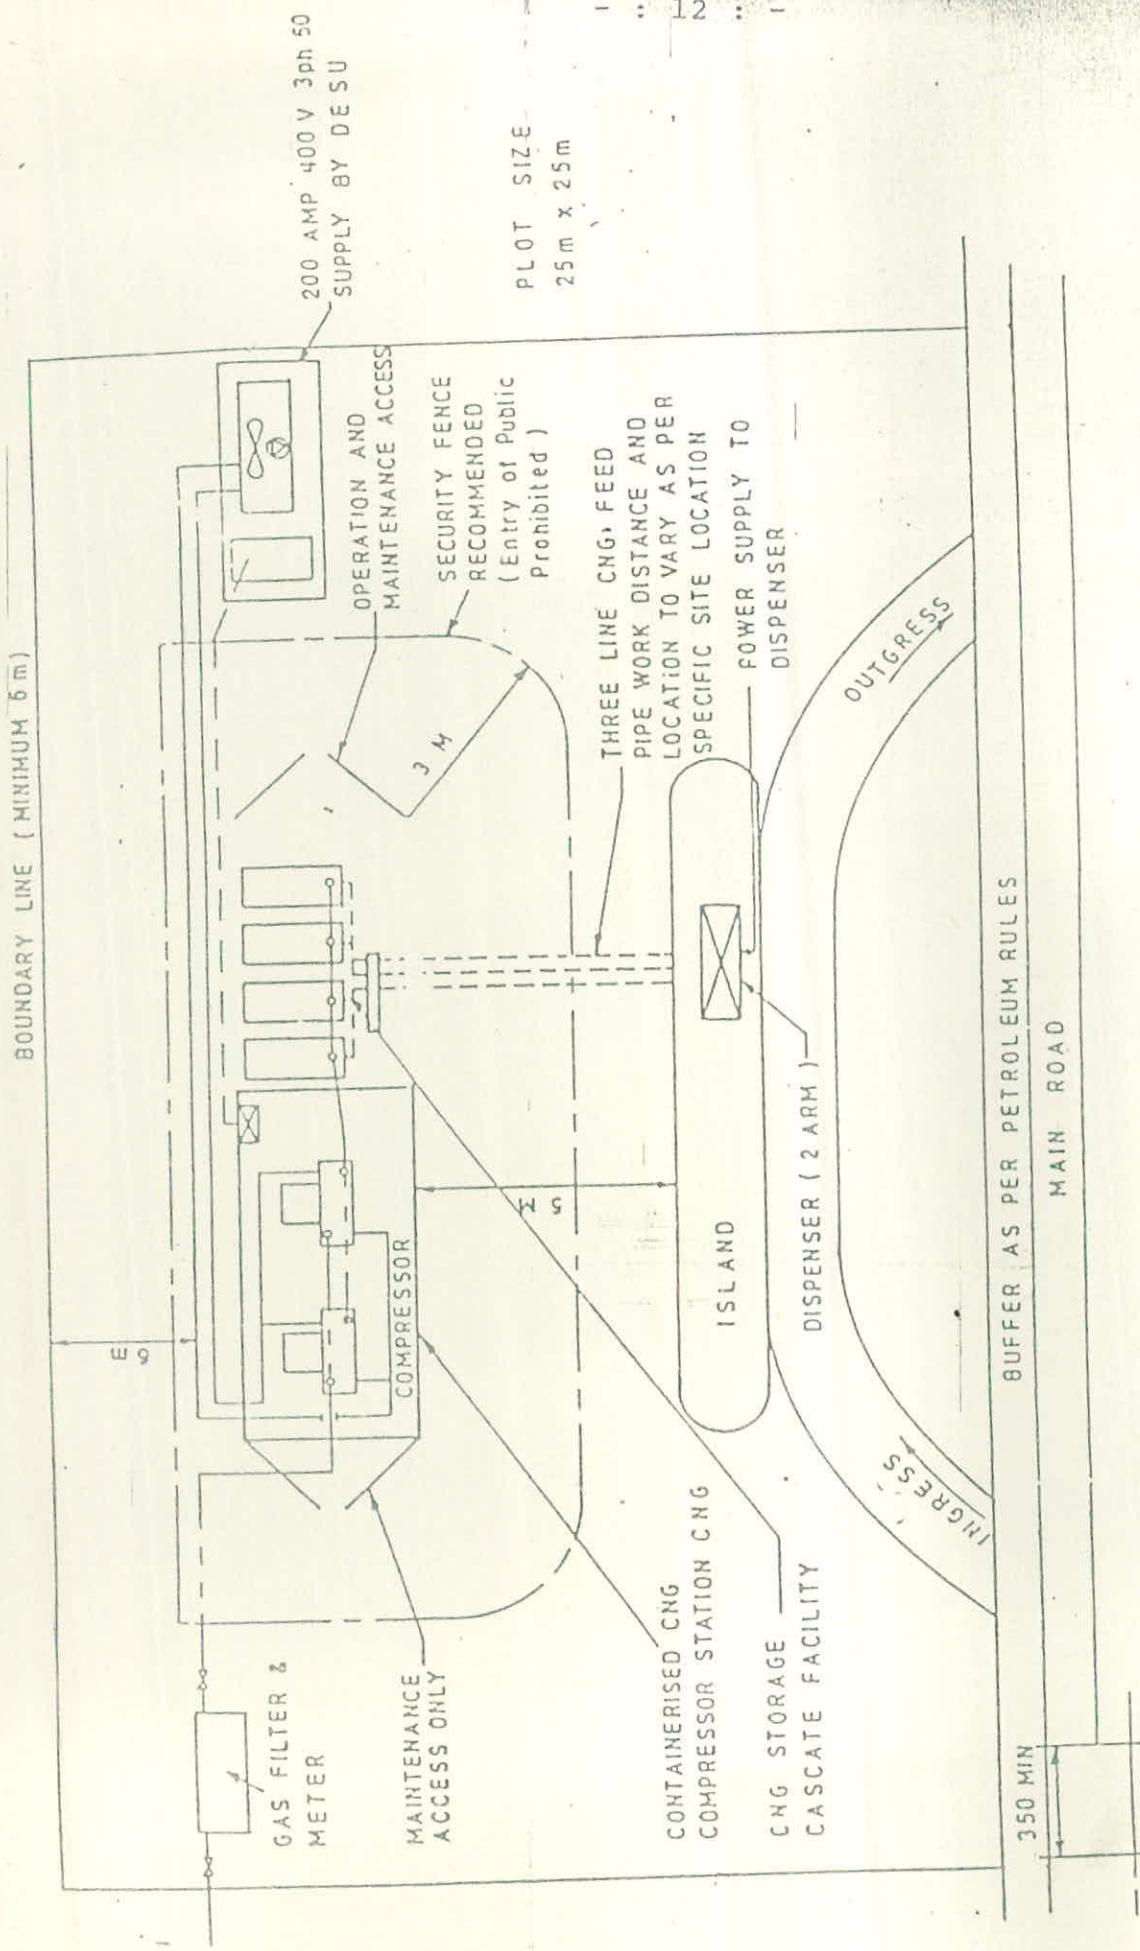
LAYOUT PLAN OF CNG REFUELING STATION
